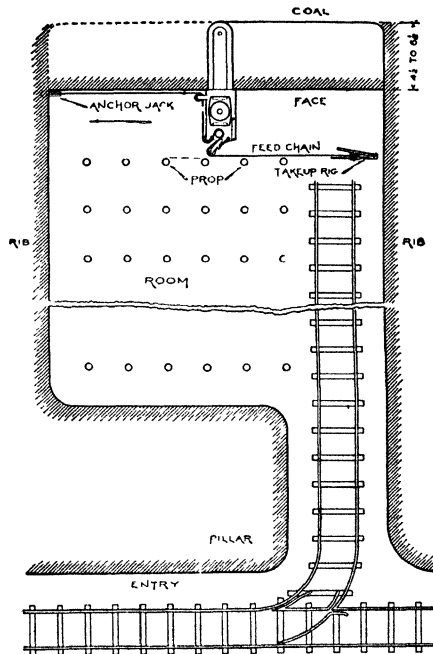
PLAN OF CHAMBER WITH SHORTWALL MACHINE CUTTING ACROSS FACE.
